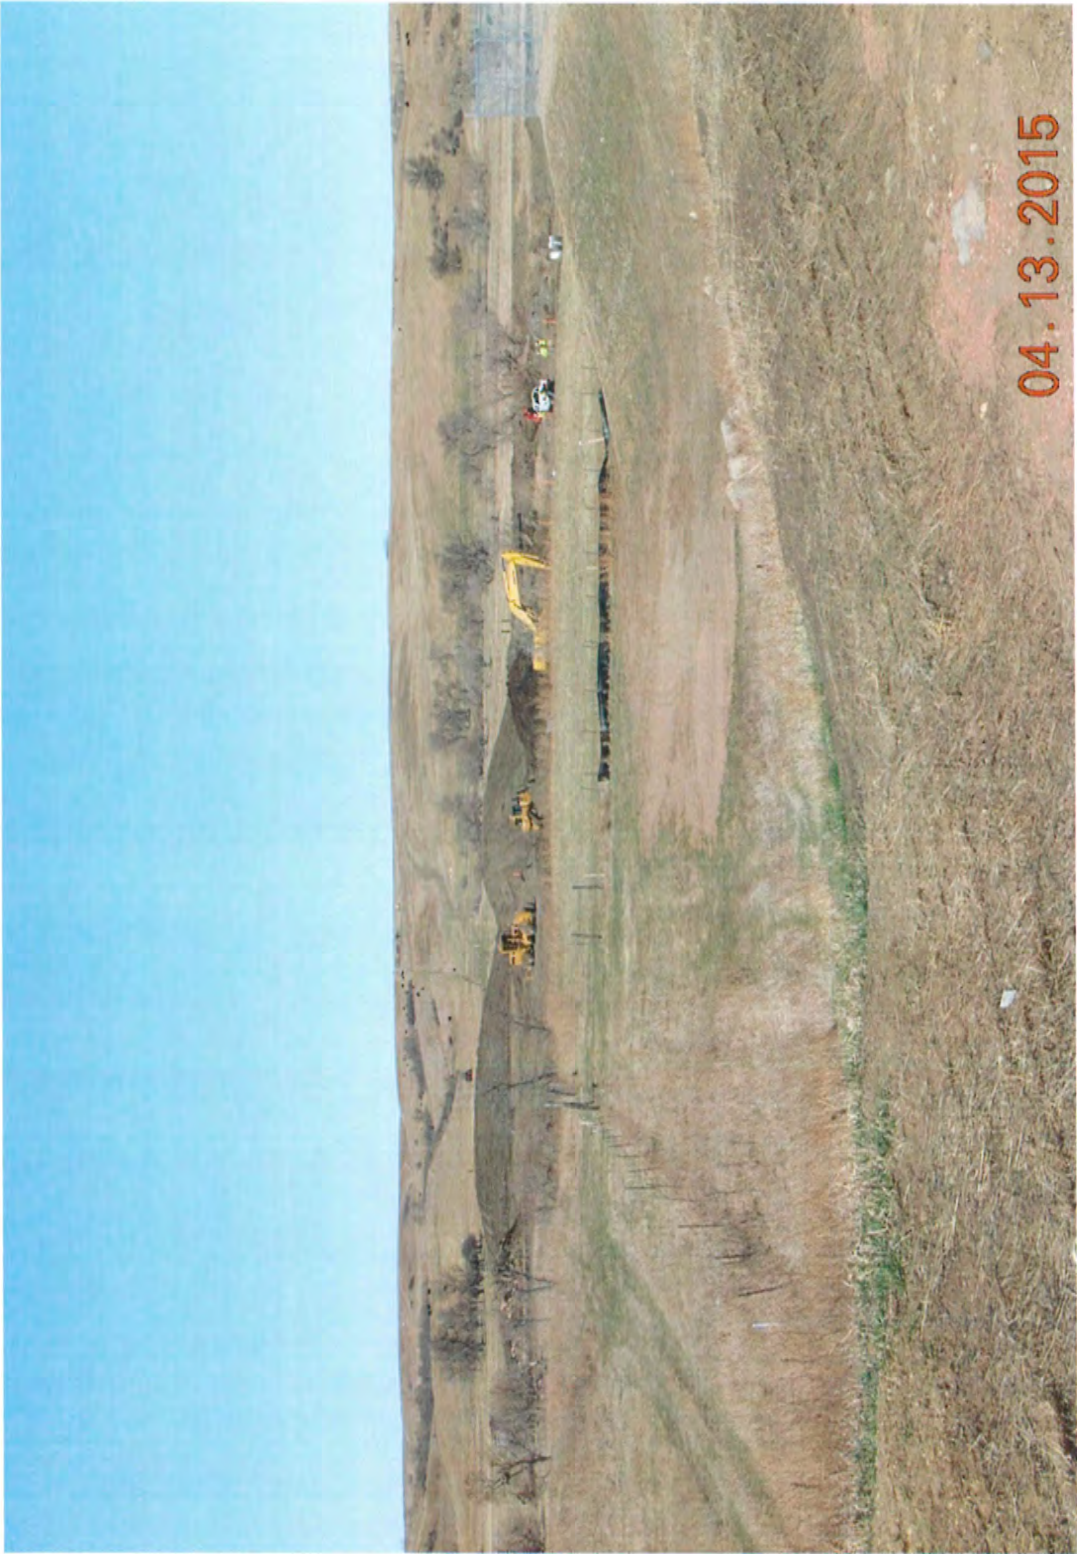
SPGM removal for a four acre segment of the Shop Access Road on both sides of Coyote Creek with a temporary topsoil stockpile in left background and a temporary subsoil stockpile in middle background – facing west with fence line in center-west marking the section line common to Section 30 on right (north) and Section 31 on left (south) – photograph taken south of large white hoop building pictured in right background in Figure 1
